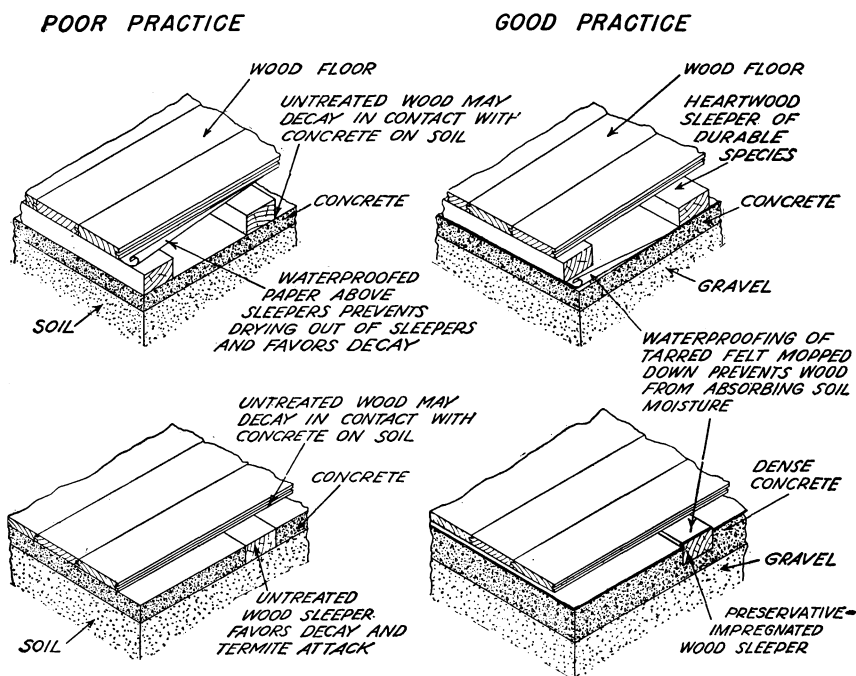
Wood floors on concrete slabs. Waterproofing membranes may be placed in or under the slab instead of on it.
